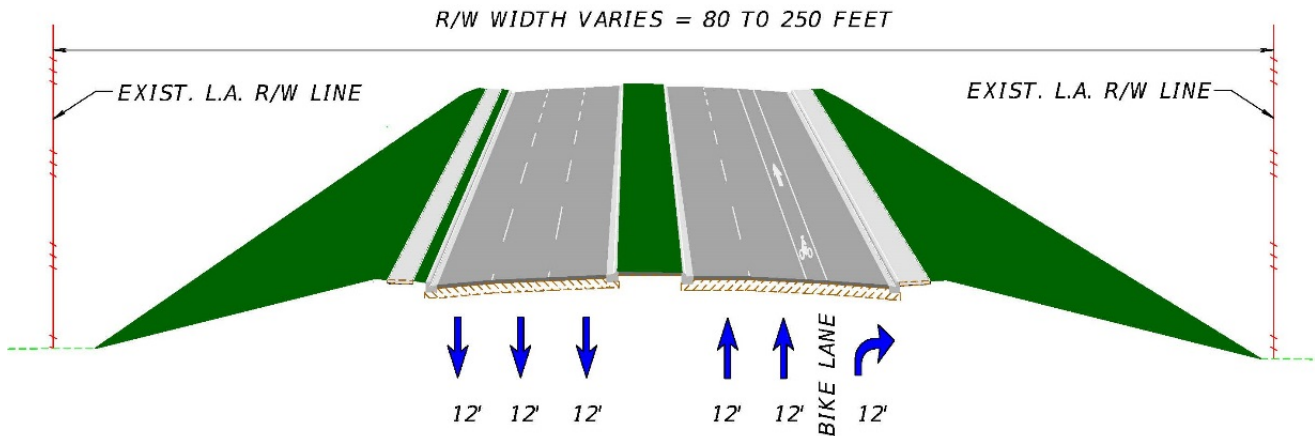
Existing Typical Section – SR 804/Boynton Beach Boulevard
